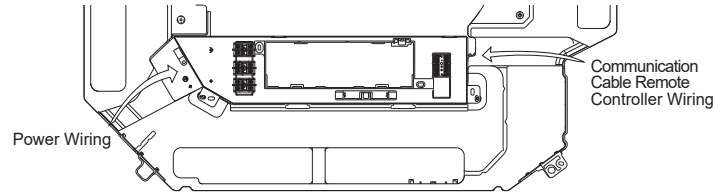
TA Frame Four-Way Cassette Wiring / Cable Routing.
